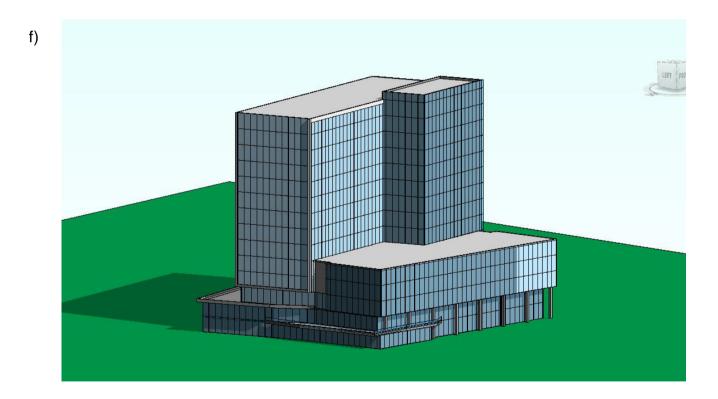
BIM Generated: e) Exterior South West Elevation View f) Exterior Isometric 3D South East View
